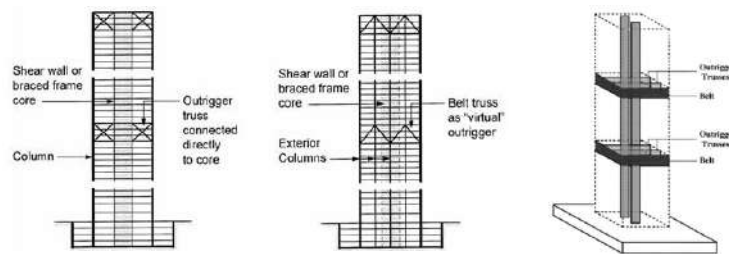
Conventional and virtual outrigger and belt truss system [11],[7].
